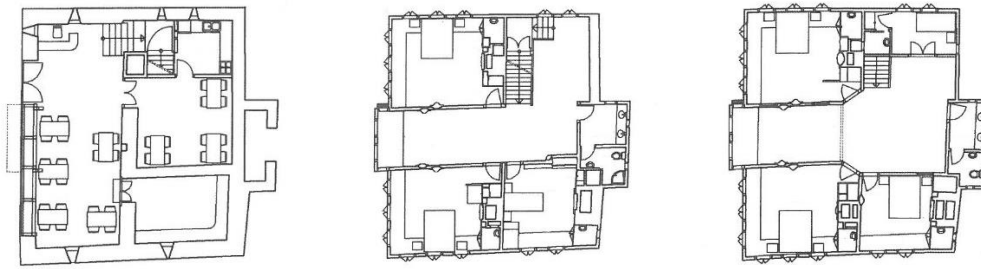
Ground, first and second floor plans of Arap Hacılar House in Safranbolu (Bayazit, 2014b: 40)
